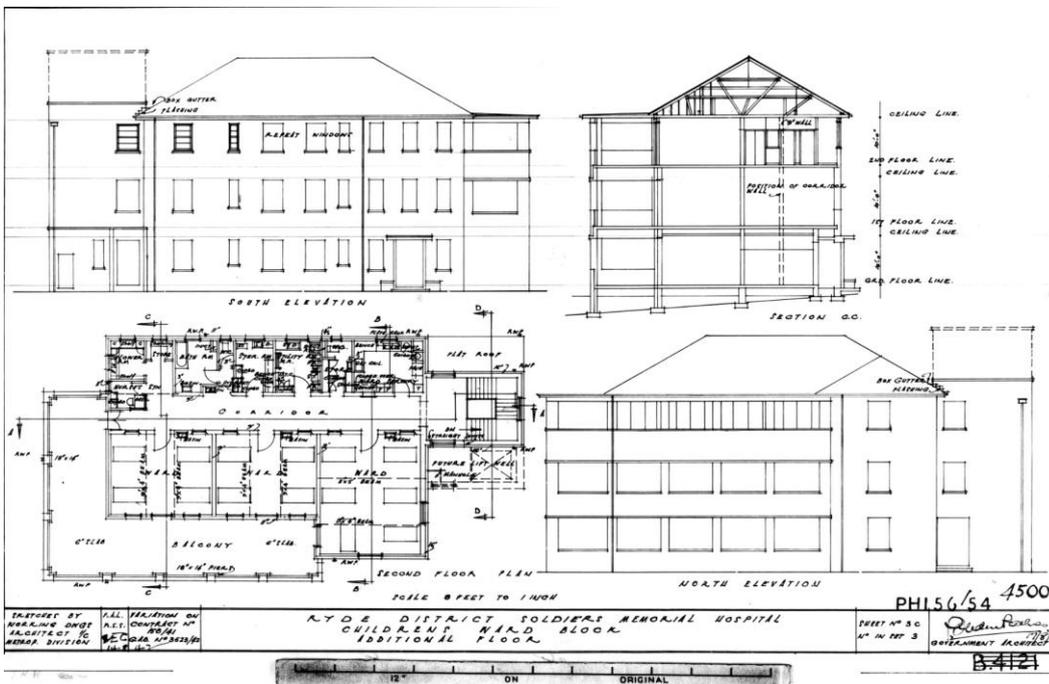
Sections, plan and elevations of the three storey Trigg House (1942)
